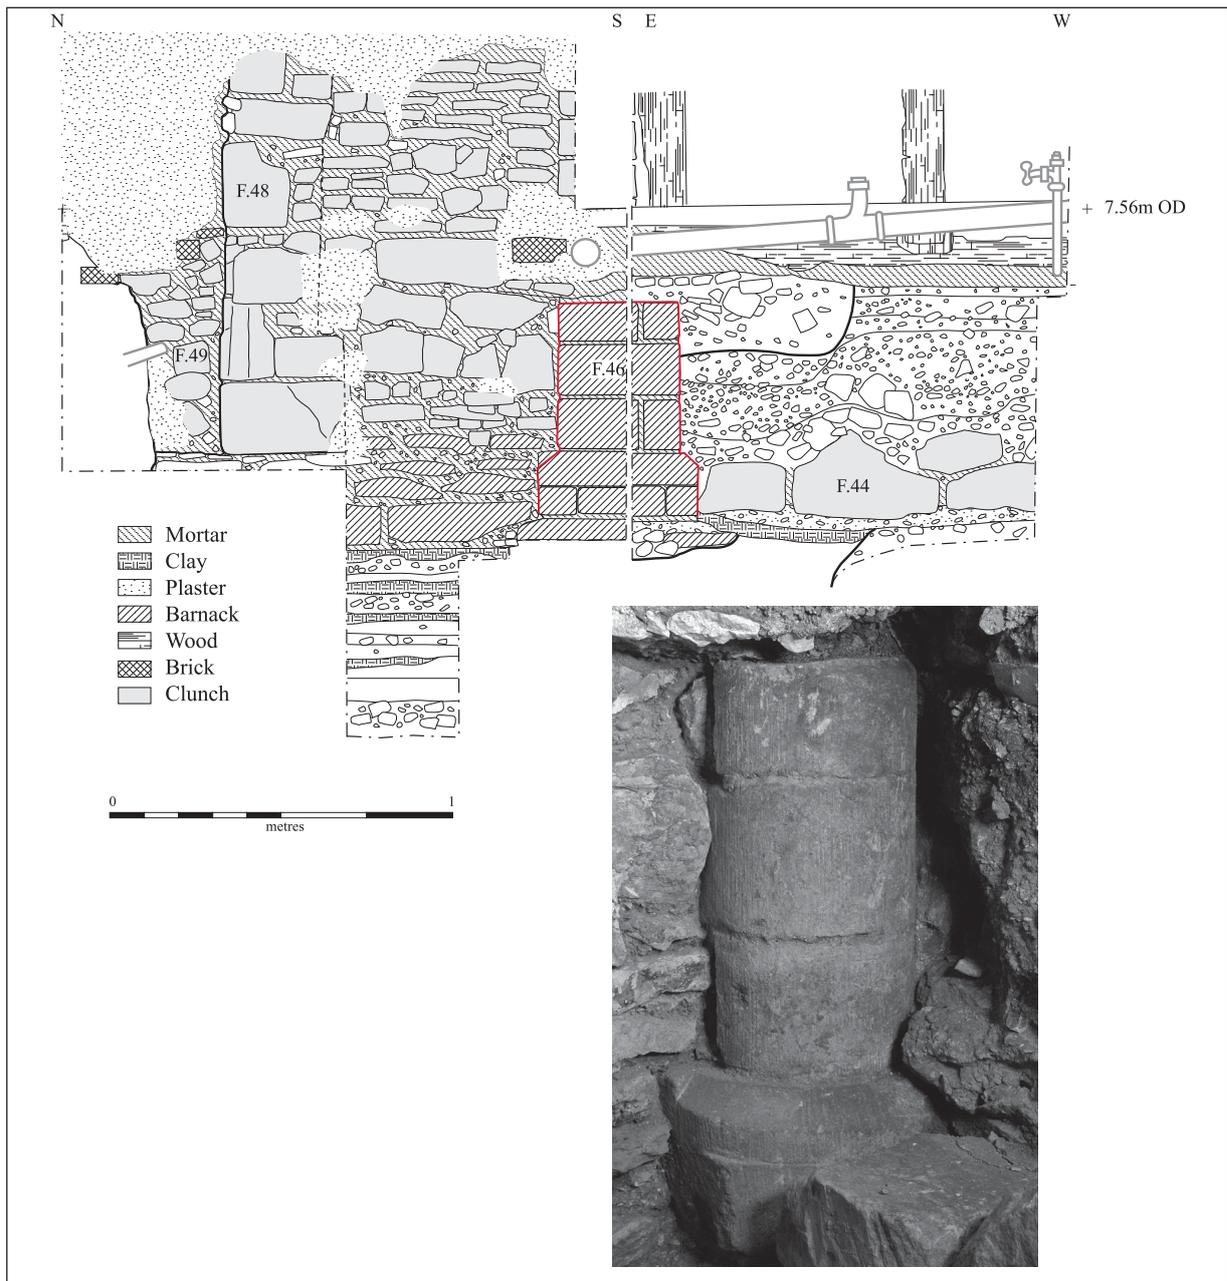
West and north facing sections of Area 6, with inset photograph of in situ wall-shaft F.46.
